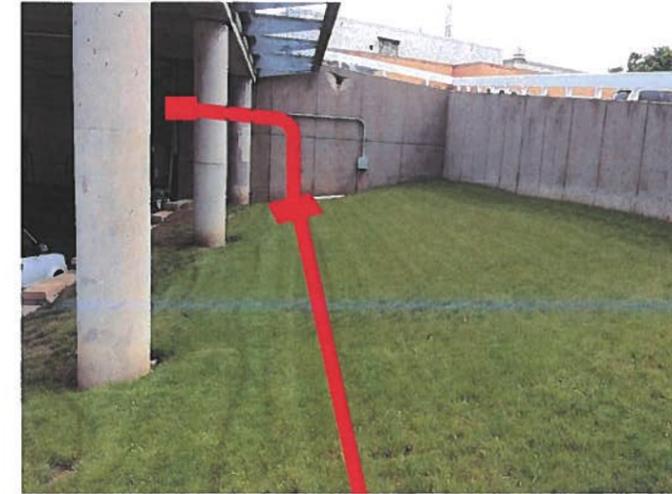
ROUTE FROM RIGHT OF WAY TO PROPOSED HANDHOLE AT BUILDING. (FACING NORTHEAST) - SECTION A-A
